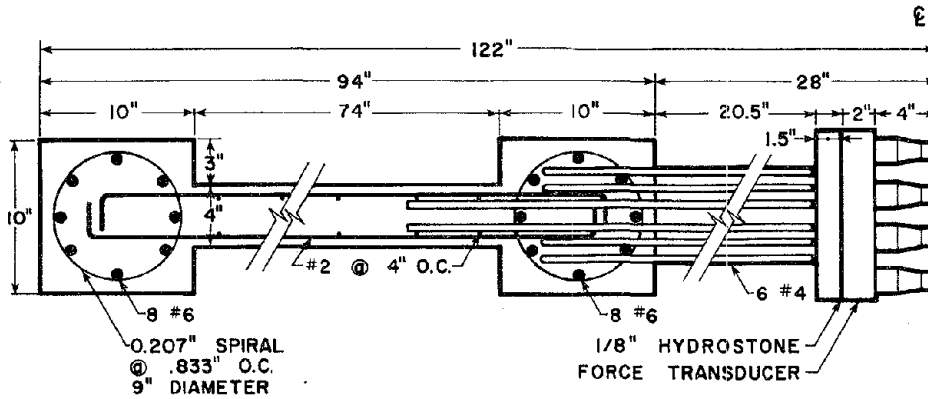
(b) DETAILING OF THE COLUMNS AND THE THIRD FLOOR BEAM-COLUMN INTERFACE
